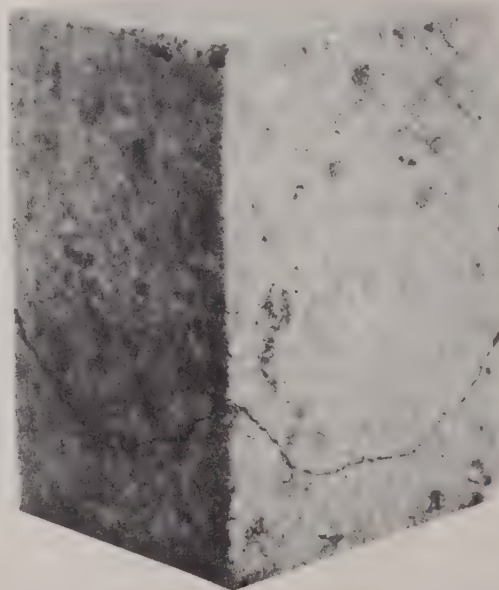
Typical specimen after spalling test, showing cobblestone type of fracture; rate of heating 17°C (31°F) per min.
